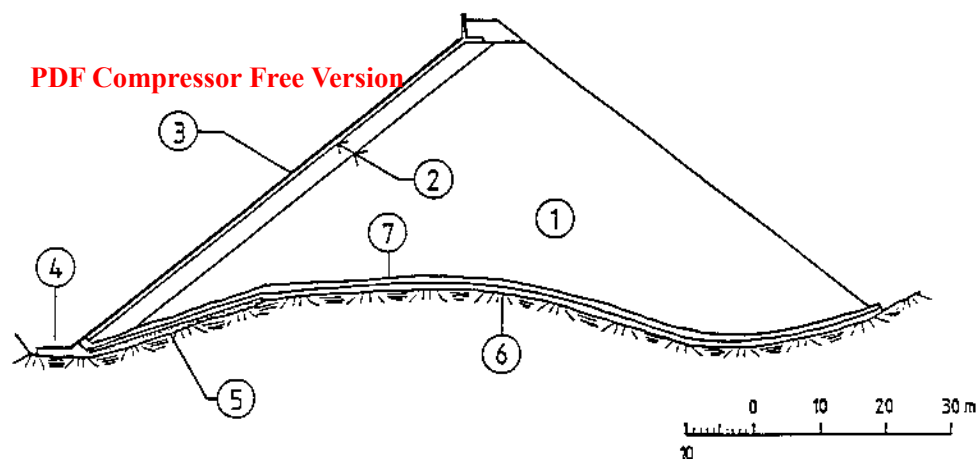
Foundation treatment and toe slab for left abutment of Lower Pieman Dam, (1) Rockfill zone, (2) Transition zones, (3) Concrete face slab, (4) Plinth, (5) Shotcrete blanket, (6) Fine filter, (7) Coarse filter (Li et al. 1991).
